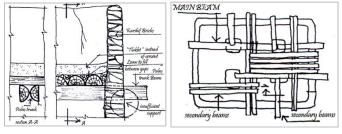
Left: Section showing the palm tree trunks used for roof construction Figure 7 Right: Looking up view of the palm trunks' roof
